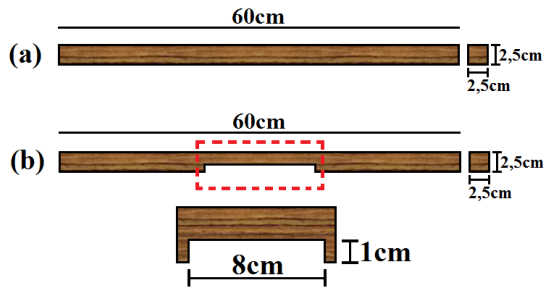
Dimensions of the specimens: (a) Flawless; (b) defective
